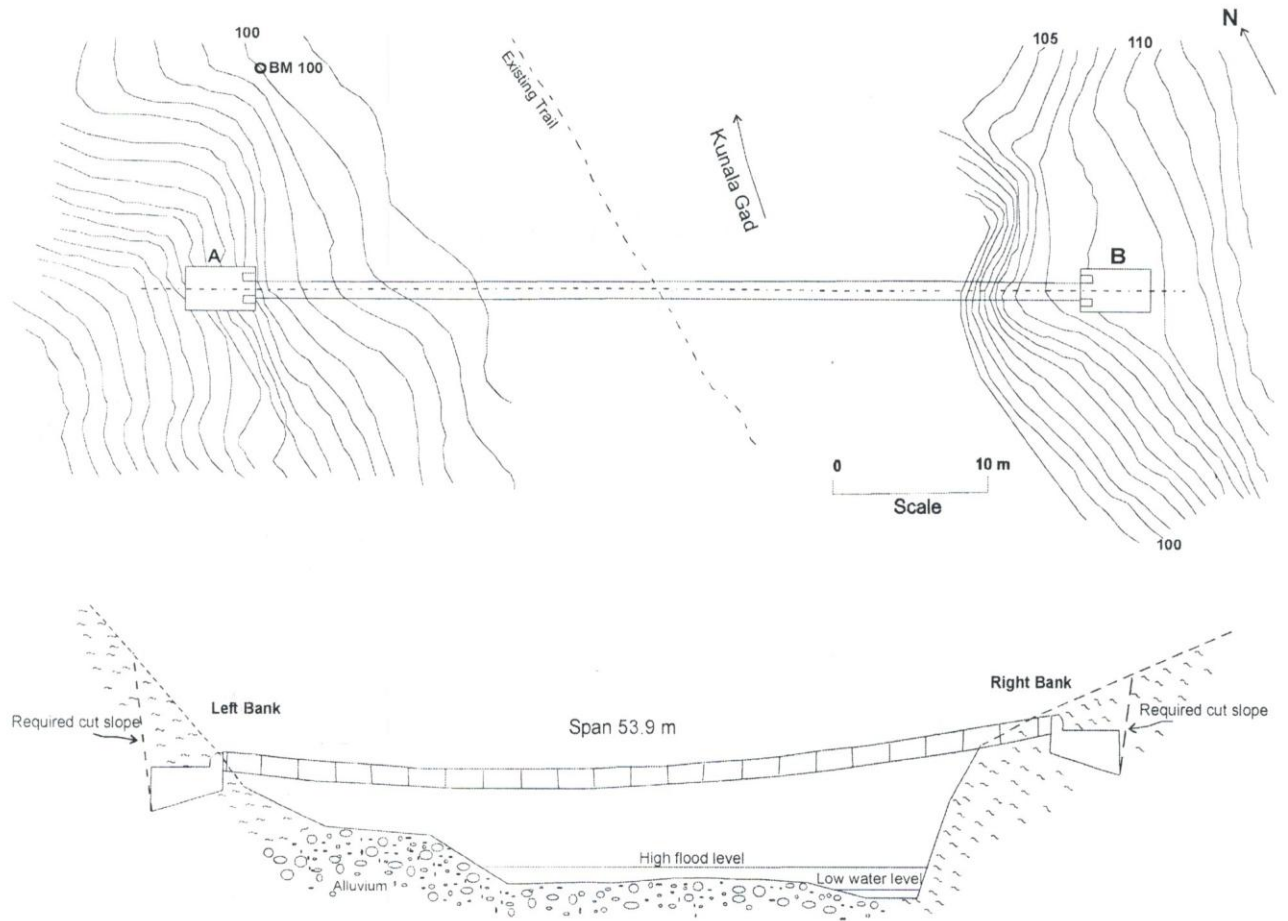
General layout of the Kunalo Gad Bridge with cross section view (modified after NEC 1997).
